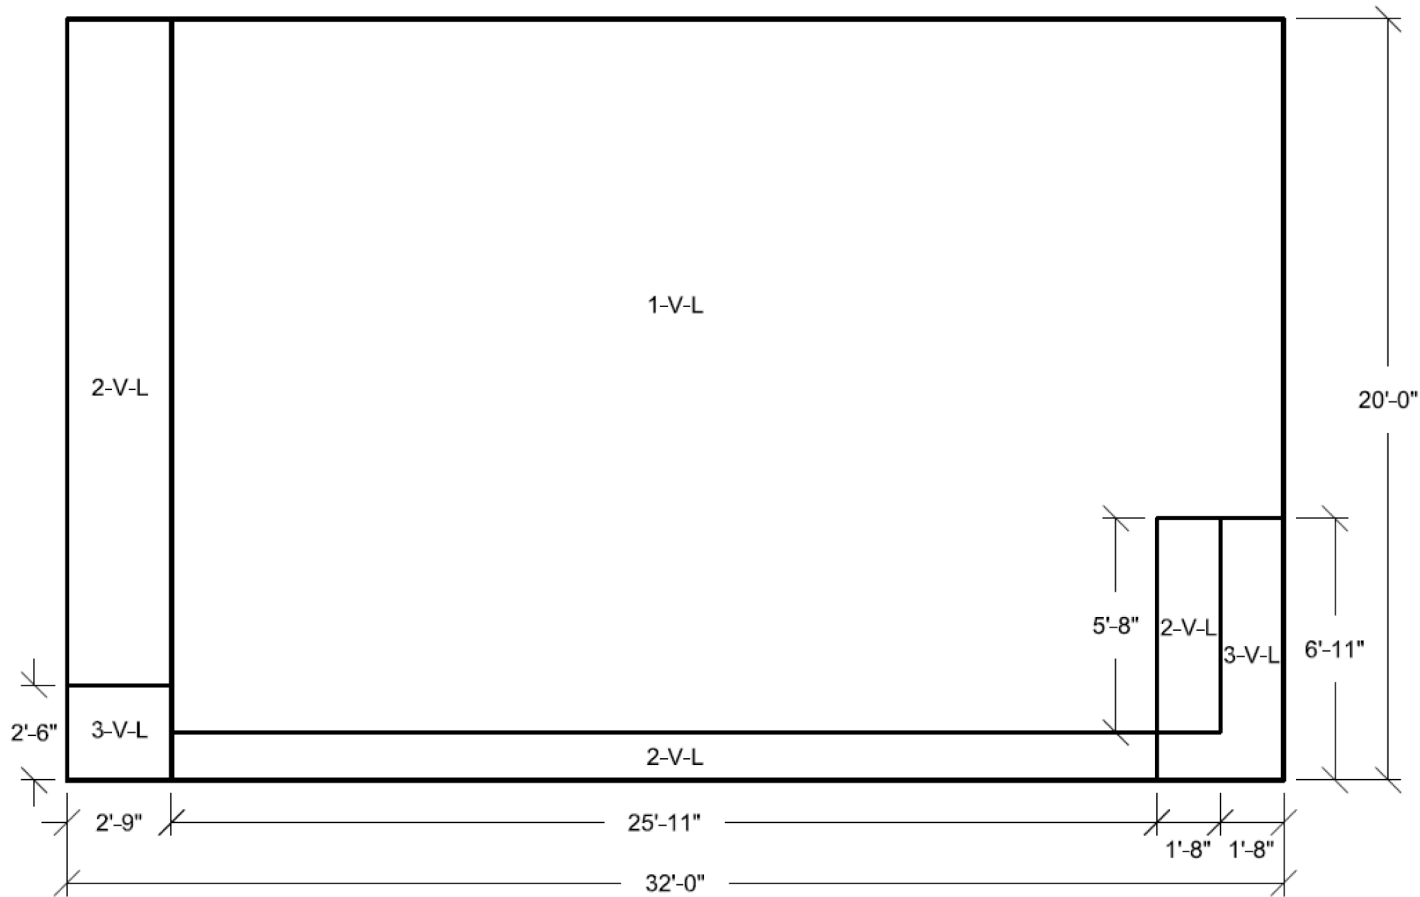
H.6-196 DGFOV Wall 14 Looking From Outside
